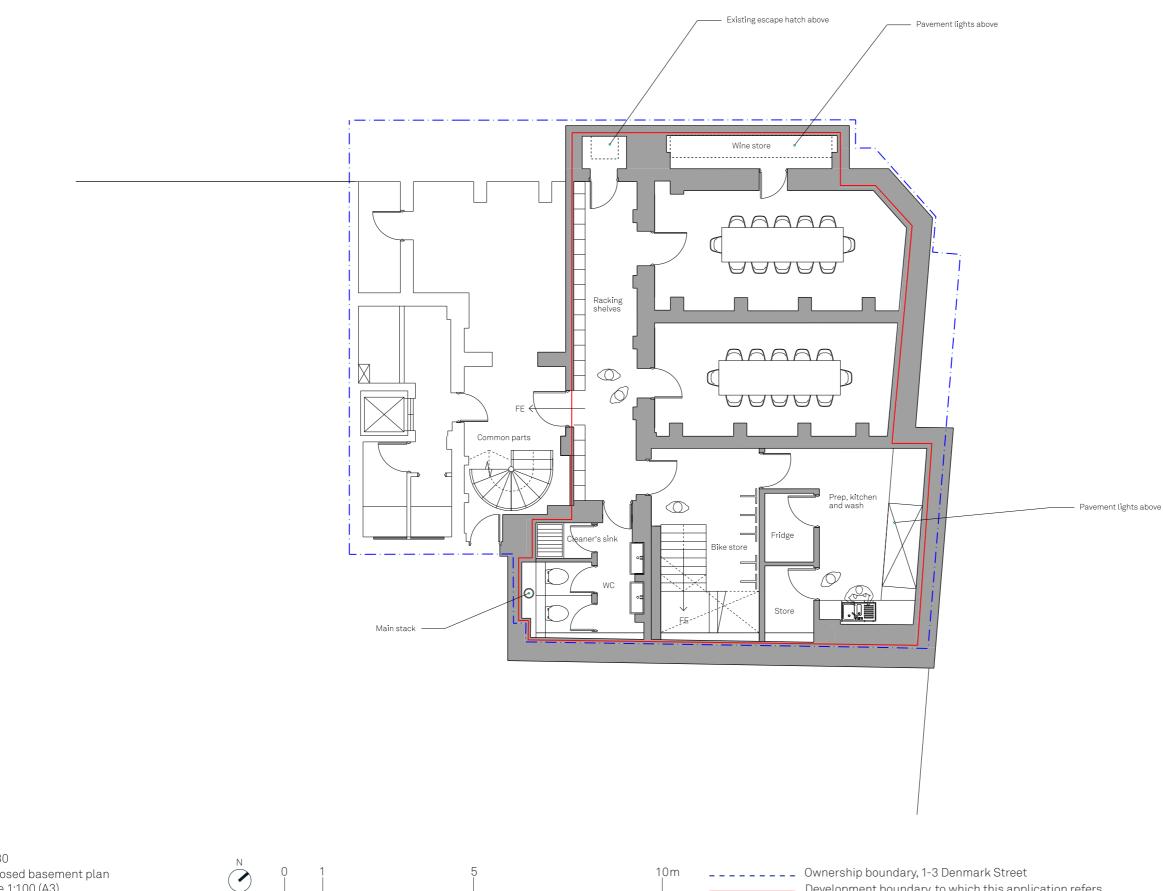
Proposed basement plan Scale 1:100 (A3)
